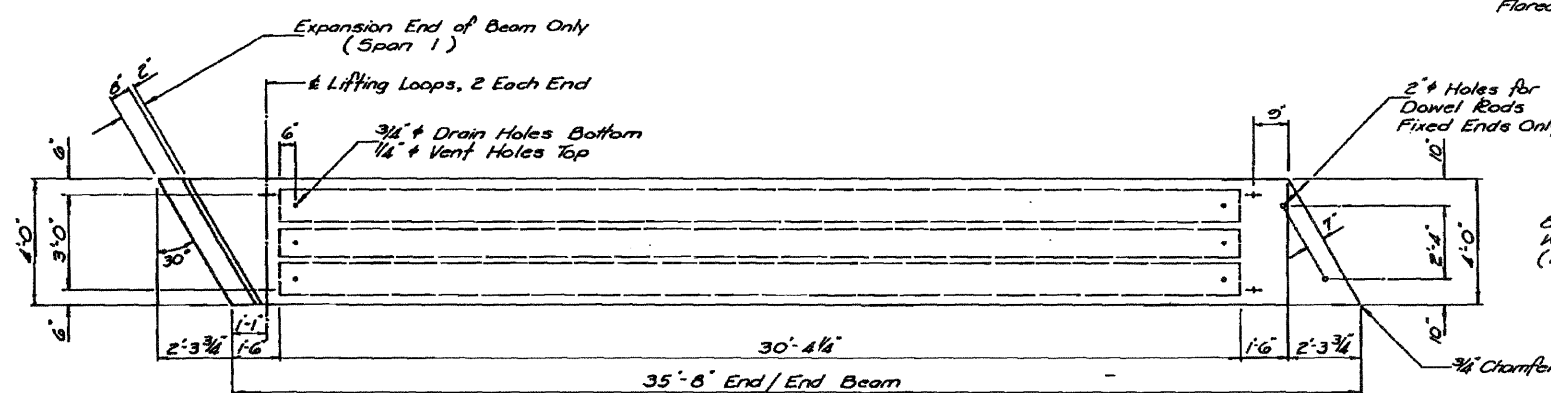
DETAILS PRECAST PRESTRESSED CONCRETE DECK BEAMS 17'x36"
